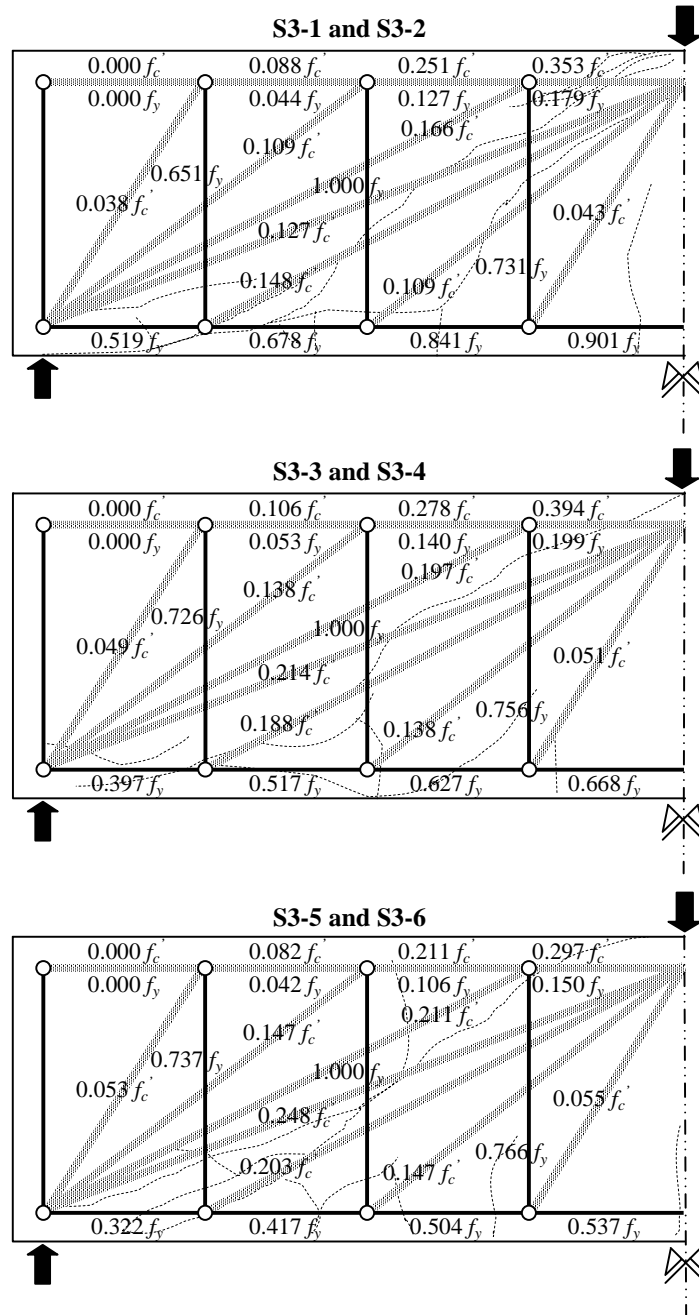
North shear span of the Series 3 beams with modified truss models
